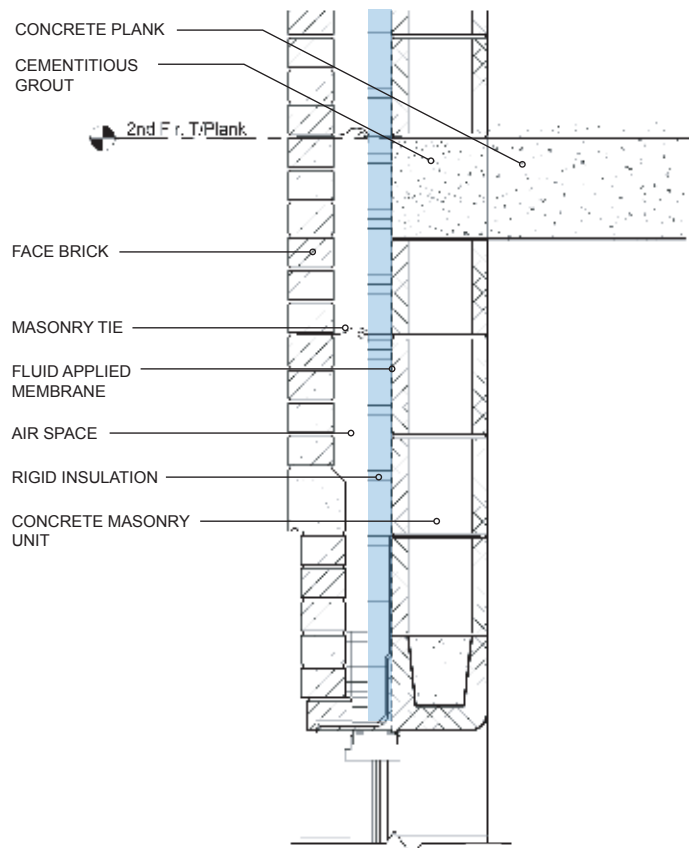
This wall system, used for the New Residence Hall at Fairfield University, shows a typical wall section with insulation in the cavity. It eliminates concerns about damaging the insulation layer from the interior. Drawing: Little Diversified Architectural Consulting
